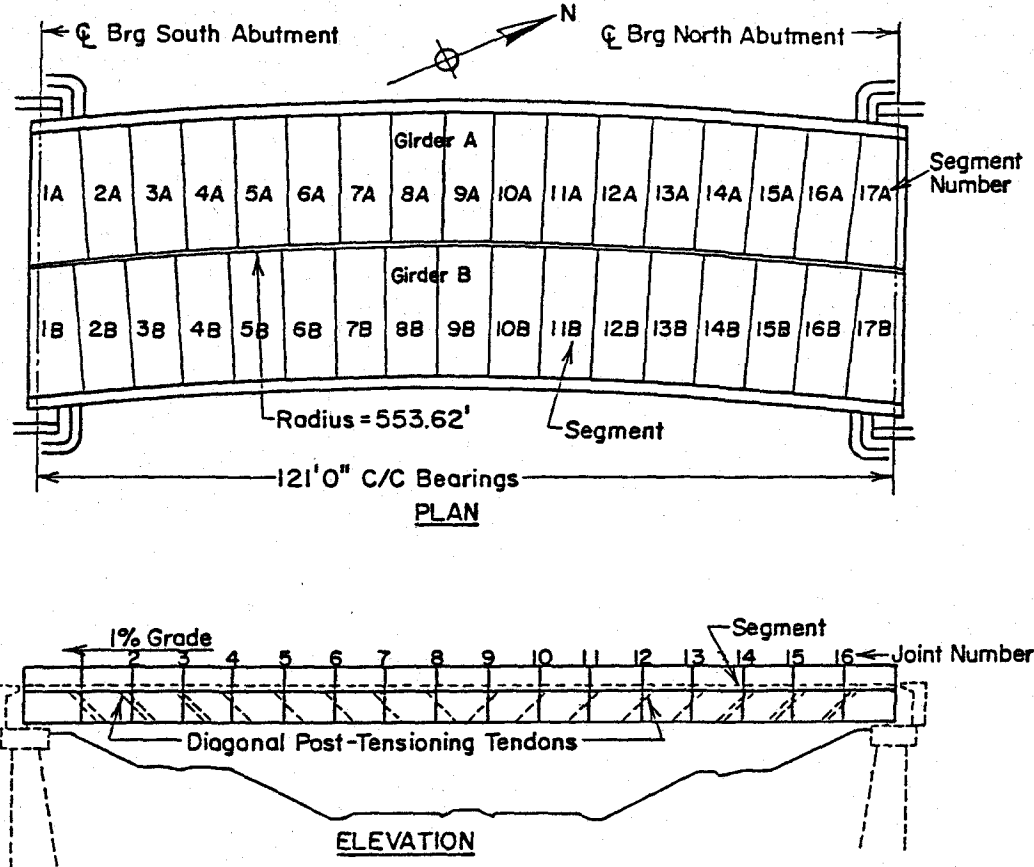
General plan and elevation of experimental segmental box girder bridge.
